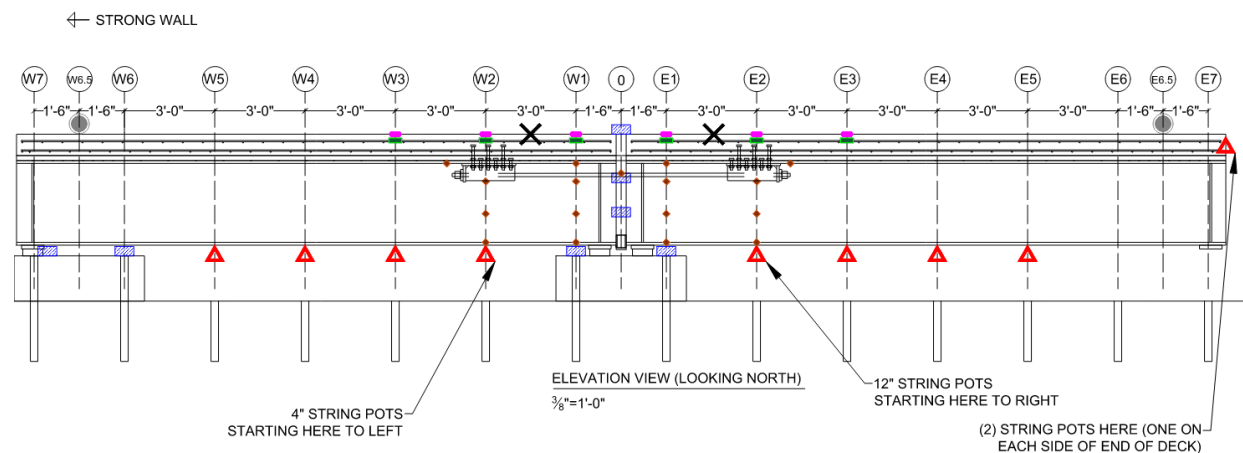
Concept B Instrumentation Plan (Elevation View).
